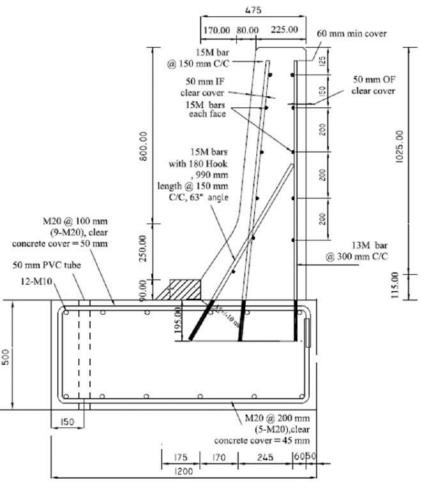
Barrier specimen B-5 details (Interior Location - No Cantilever - Post-Installed)
